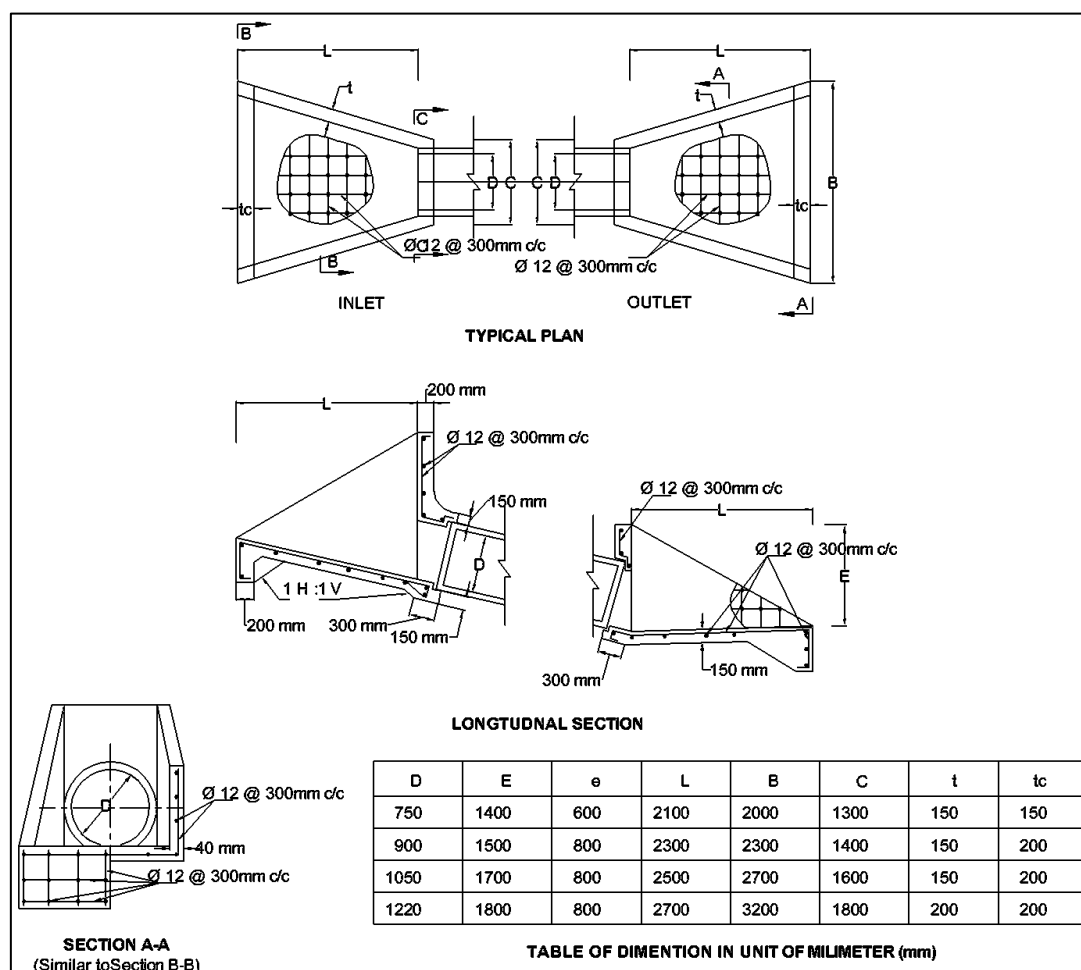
Drawings of transition Type-II inlet &amp; outlet
